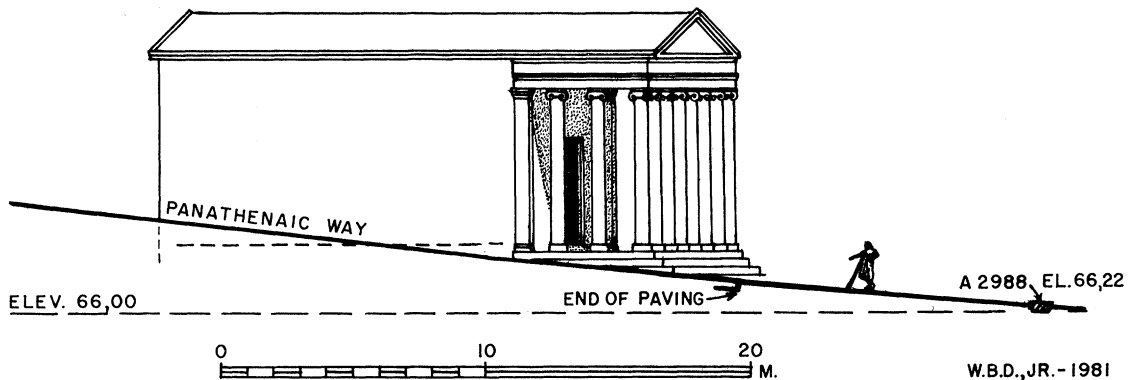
Section through the Panathenaic Way with the Southeast Temple in elevation
